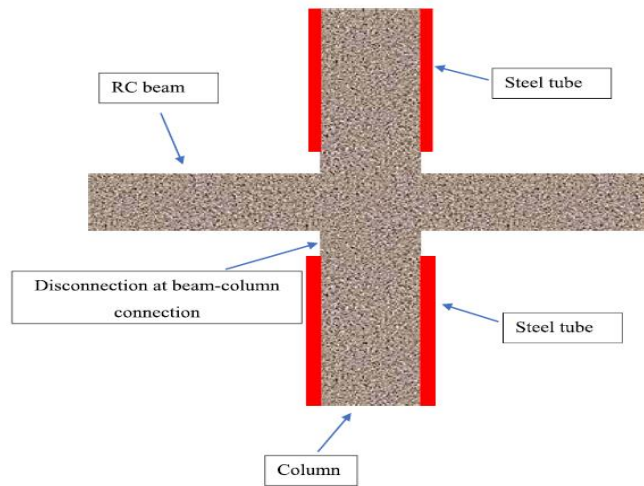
Beam-column construction joint of STCC column (Tomii, M. 1985)
